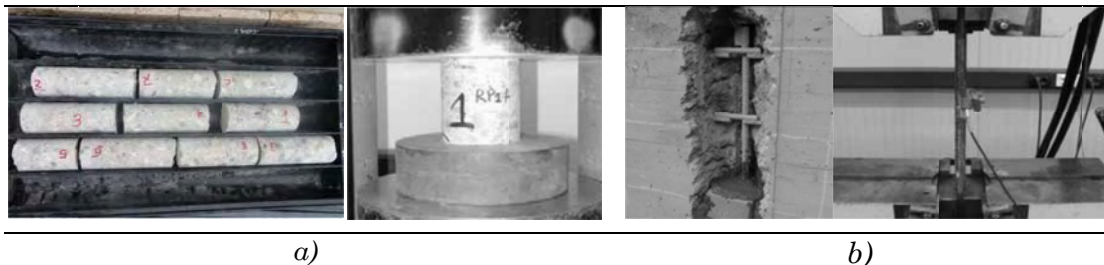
Laboratory tests: a) core borings and compressive strength tests on concrete samples. b) extraction of reinforcement bars and traction test
